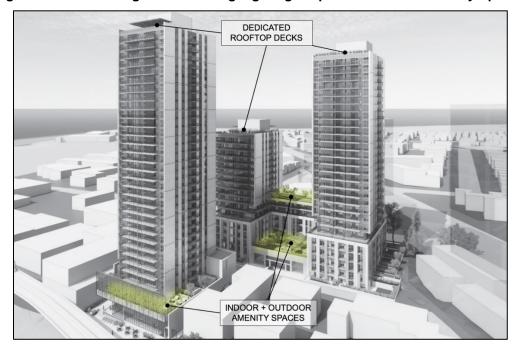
View Looking Southwest Highlighting Proposed Common Amenity Spaces
